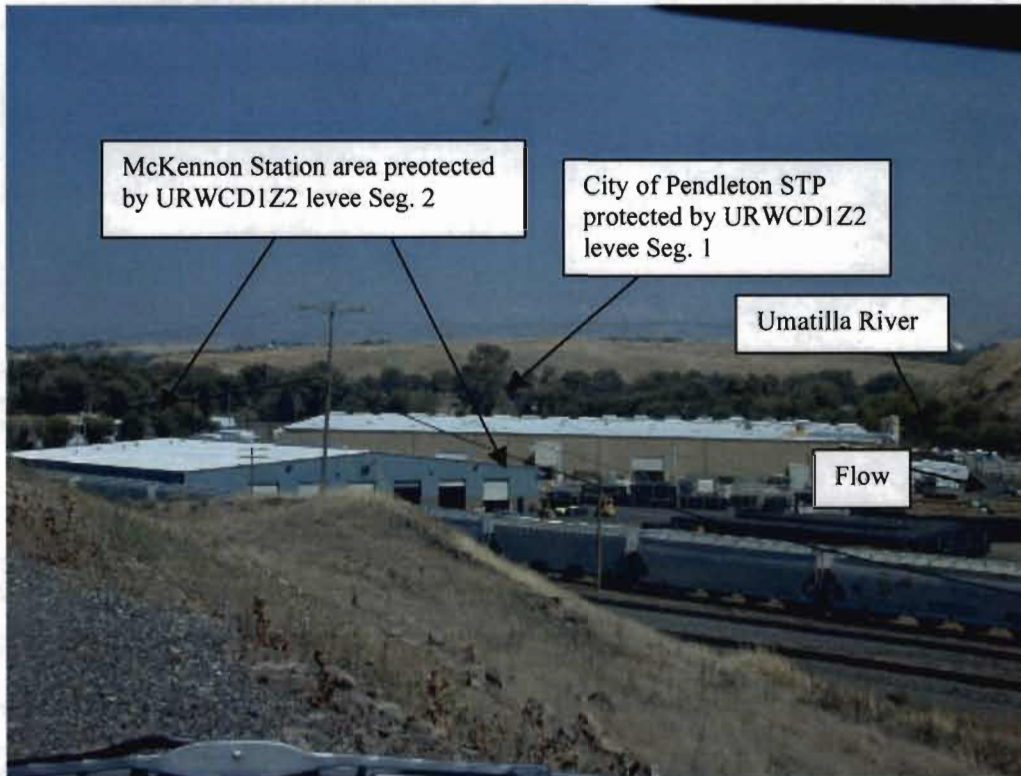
View looks east at McKennon Station industrial area southwest of Pendleton. Taken from road to Reith and Echo (Old River Road).
